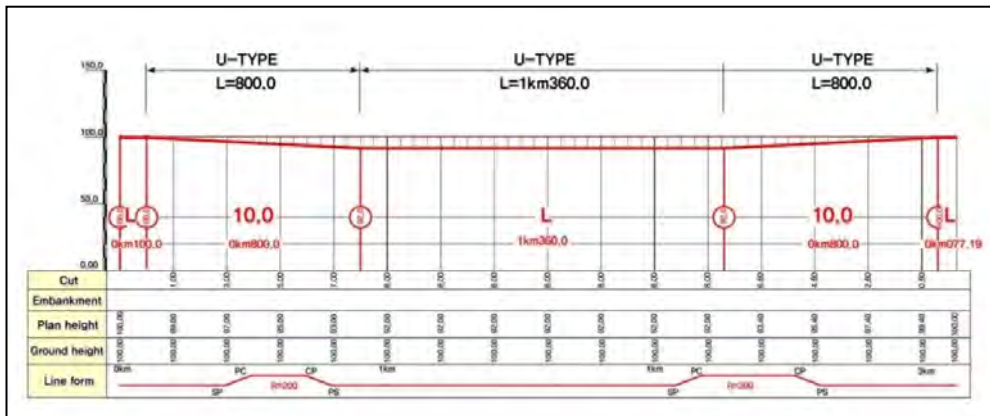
Section Proposal of Initial Track Layout - Lowering Case
